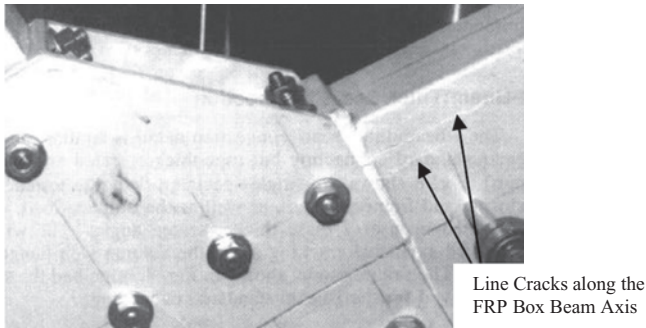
Local failure of the FRP gusset plate connection detail.
